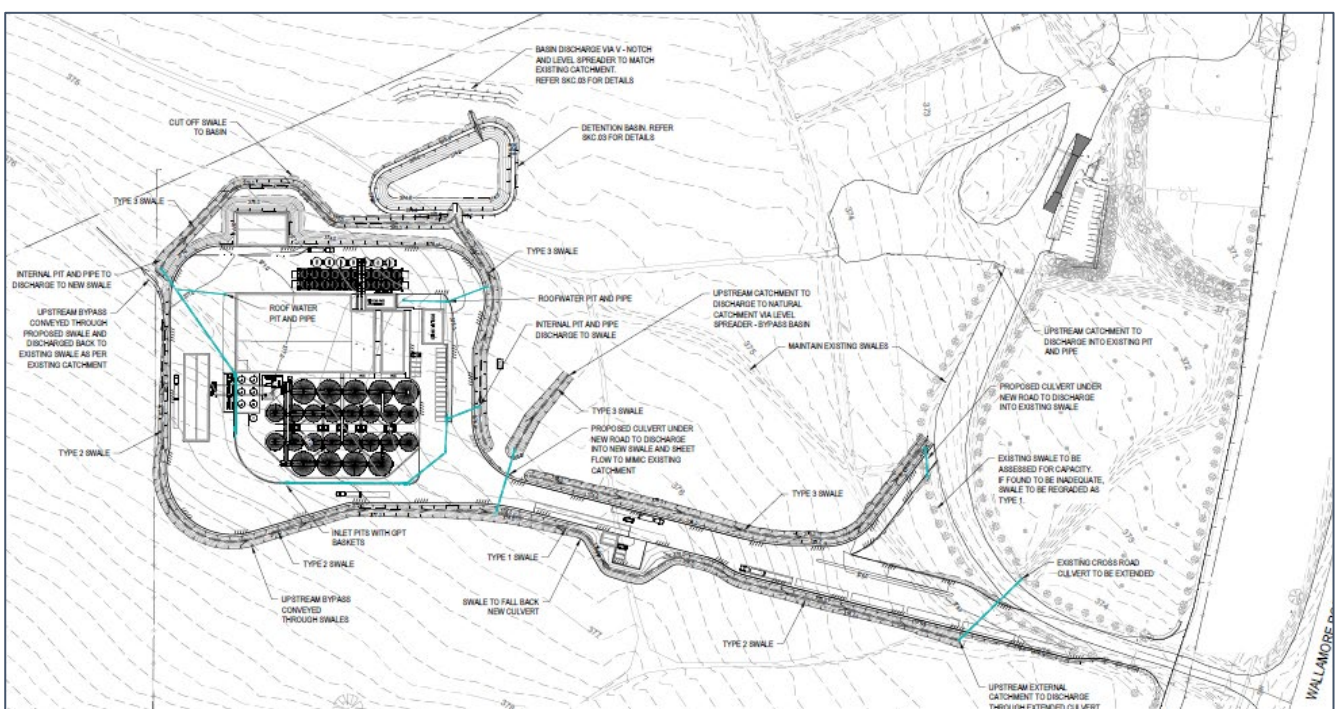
Stormwater Management Plan (MPN Consulting, 2024)
